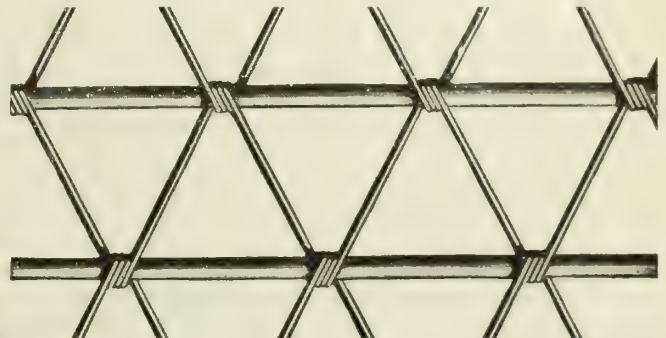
TRIANGLE MESH WOVEN WIRE CONCRETE REINFORCEMENT
